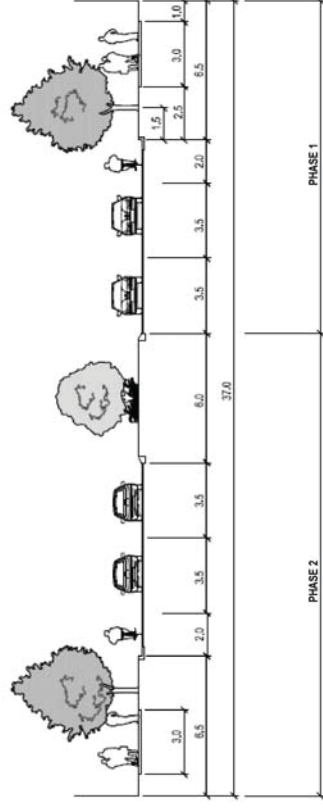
F Sub-arterial Road Type B with kerb and channel
